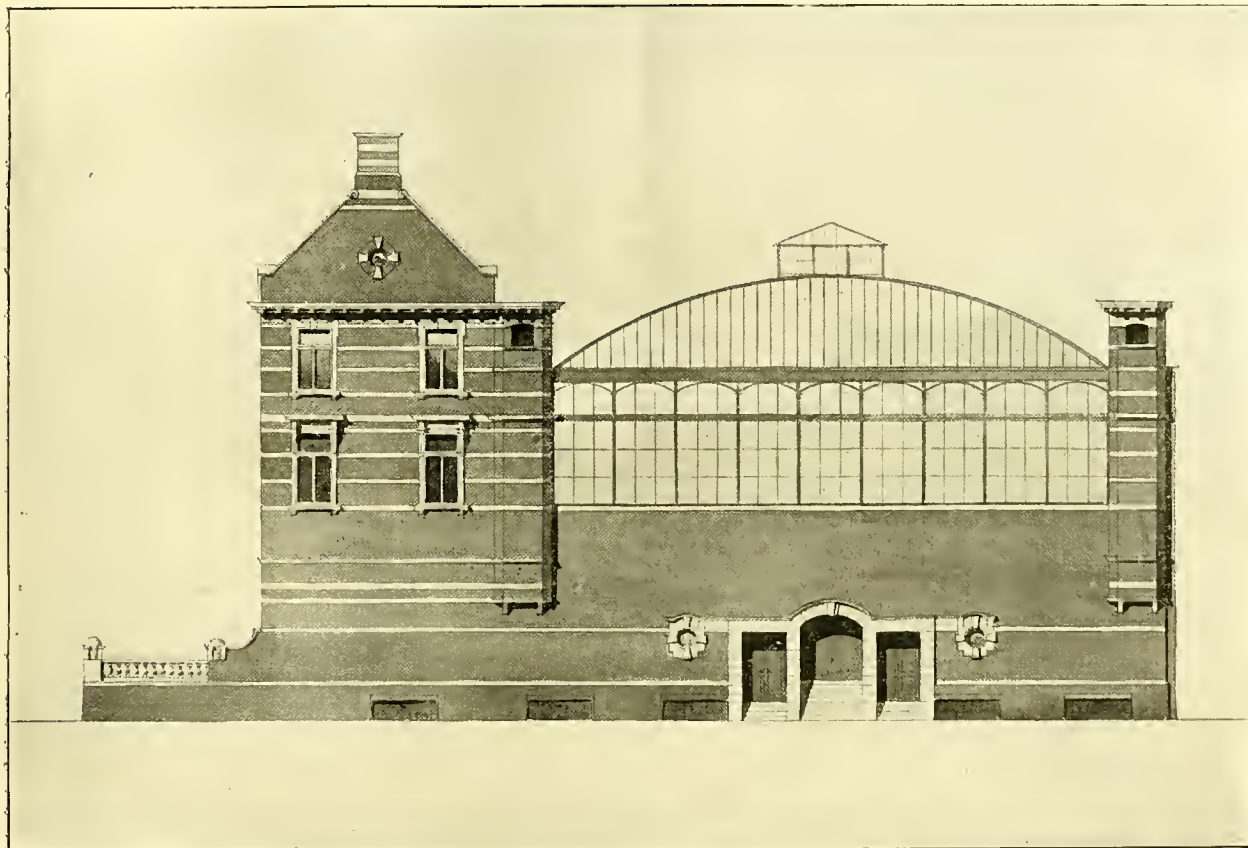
SIDE VIEW OF THE PROPOSED HORTICULTURAL HALL BUILDINGS, FACING BELL-STREET. (SEE P. 378.)
